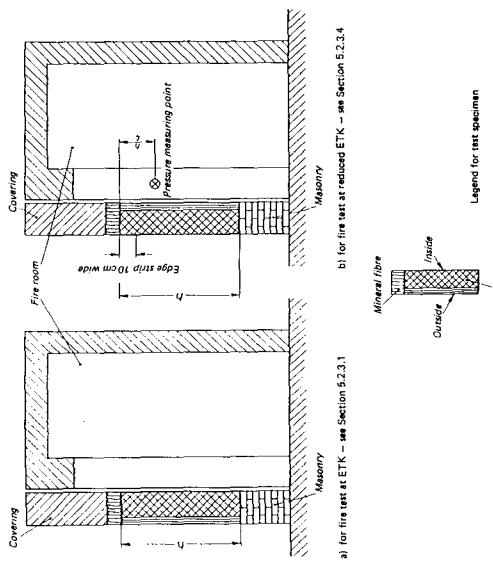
Test arrangement for parapets (diagrammatic) which, in practice, rest entirely on a reinforced concrete base.
